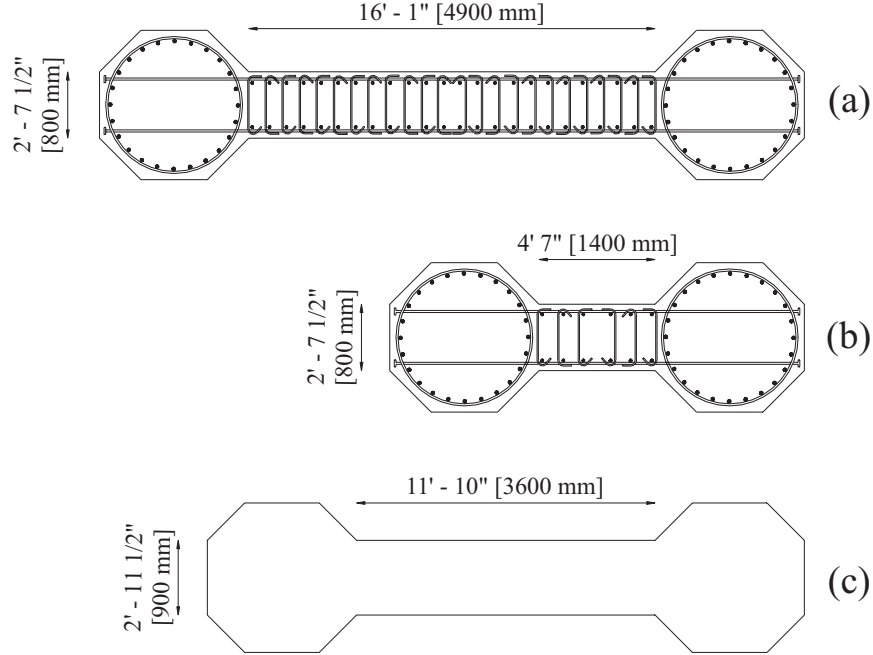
(a) Long structural wall in bridge transverse direction. (b) Short structural wall in bridge longitudinal direction. (c) Test unit section geometry generalized from Benicia Martinez prototype.
